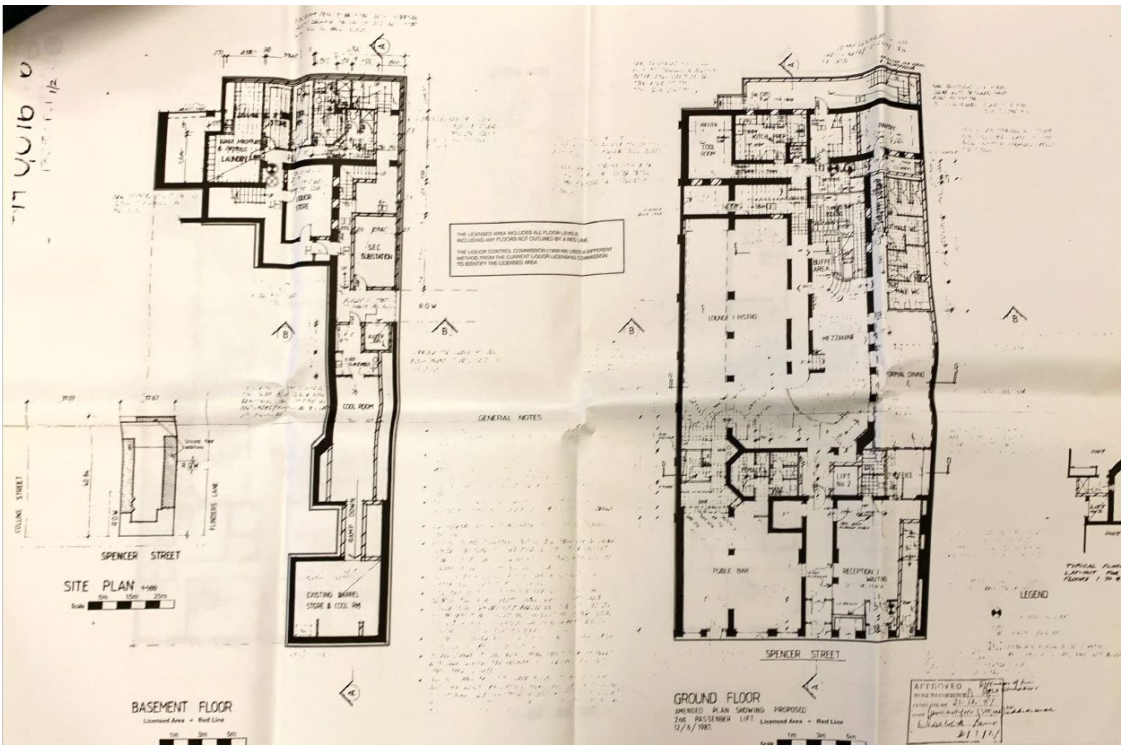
c.1987 ground floor and basement plan for the addition of a second passenger lift
